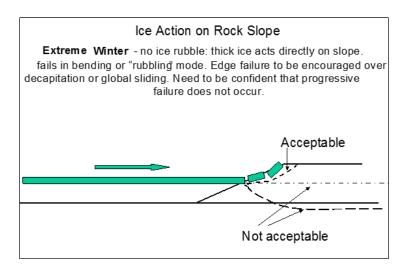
General potential failure modes of a rock berm (Croasdale, 2003)
